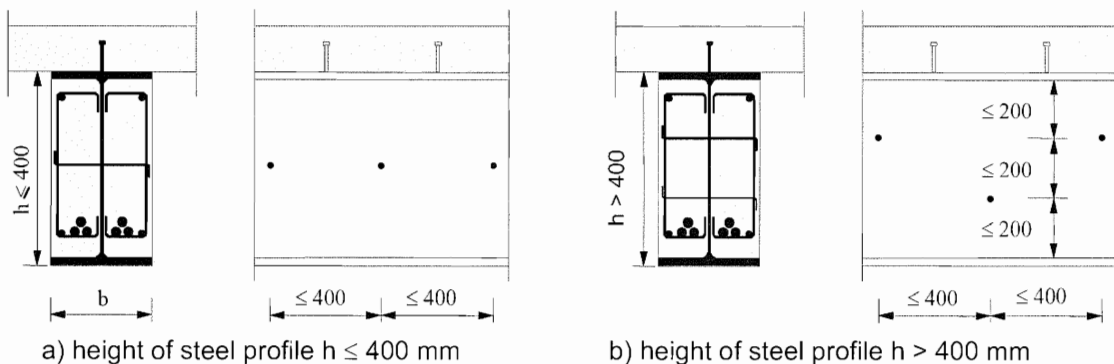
Measures providing connection between the steel profile and the encasing concrete
